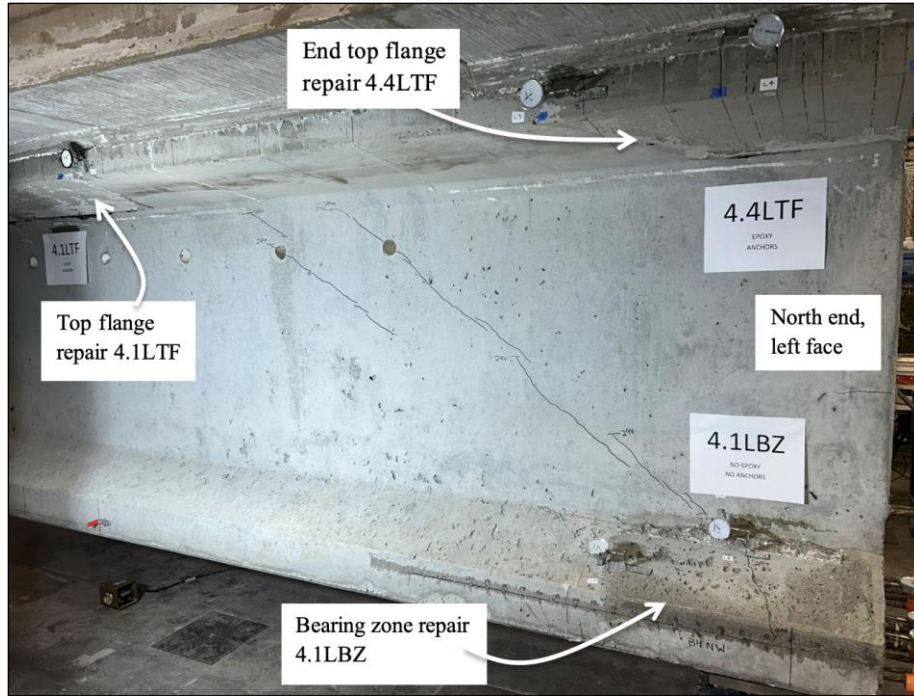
Photo. Test 4.1.S (repair 4.1LBZ, 4.1RTF, 4.1LTF, 4.4LTF) initial shear cracks on repaired face, extending into bottom flange repair 4.1LBZ at 294 kip (left face of girder pictured).
